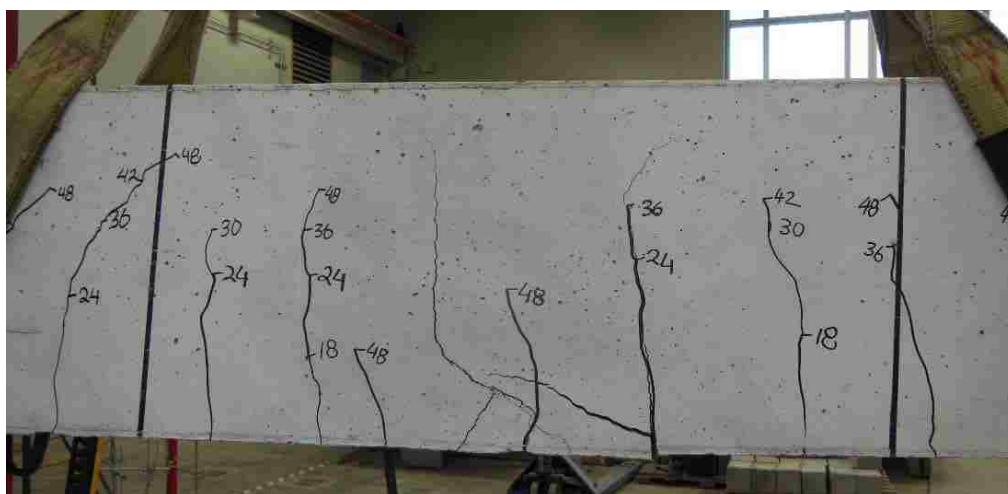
Crack Pattern of Specimen TWOC-70 (Side View)
